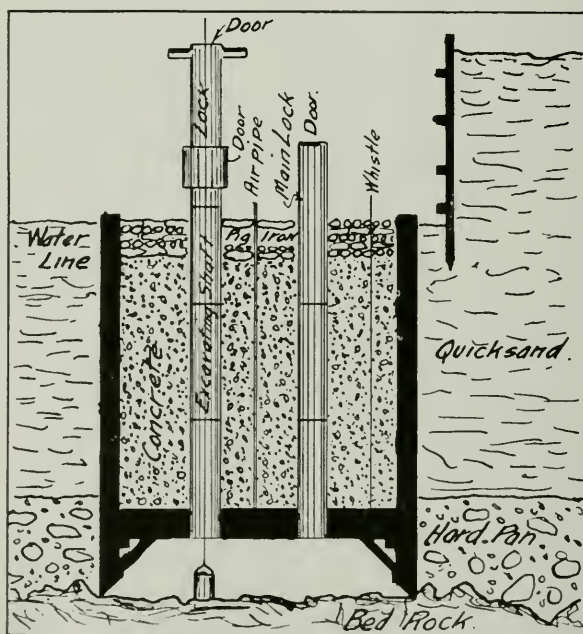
The Caisson at Bed Rock, ready for concrete in air chamber.
